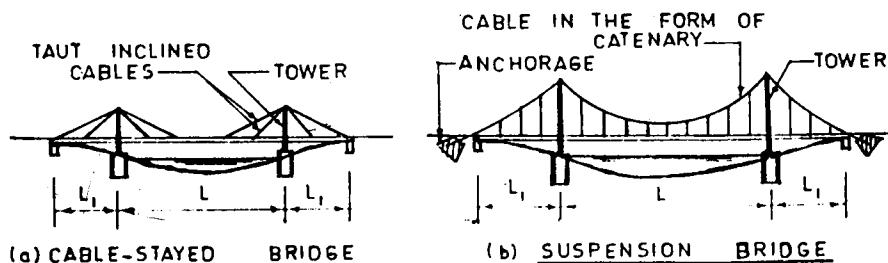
·9 CABLE-STAYED VS SUSPENSION BRIDGE
